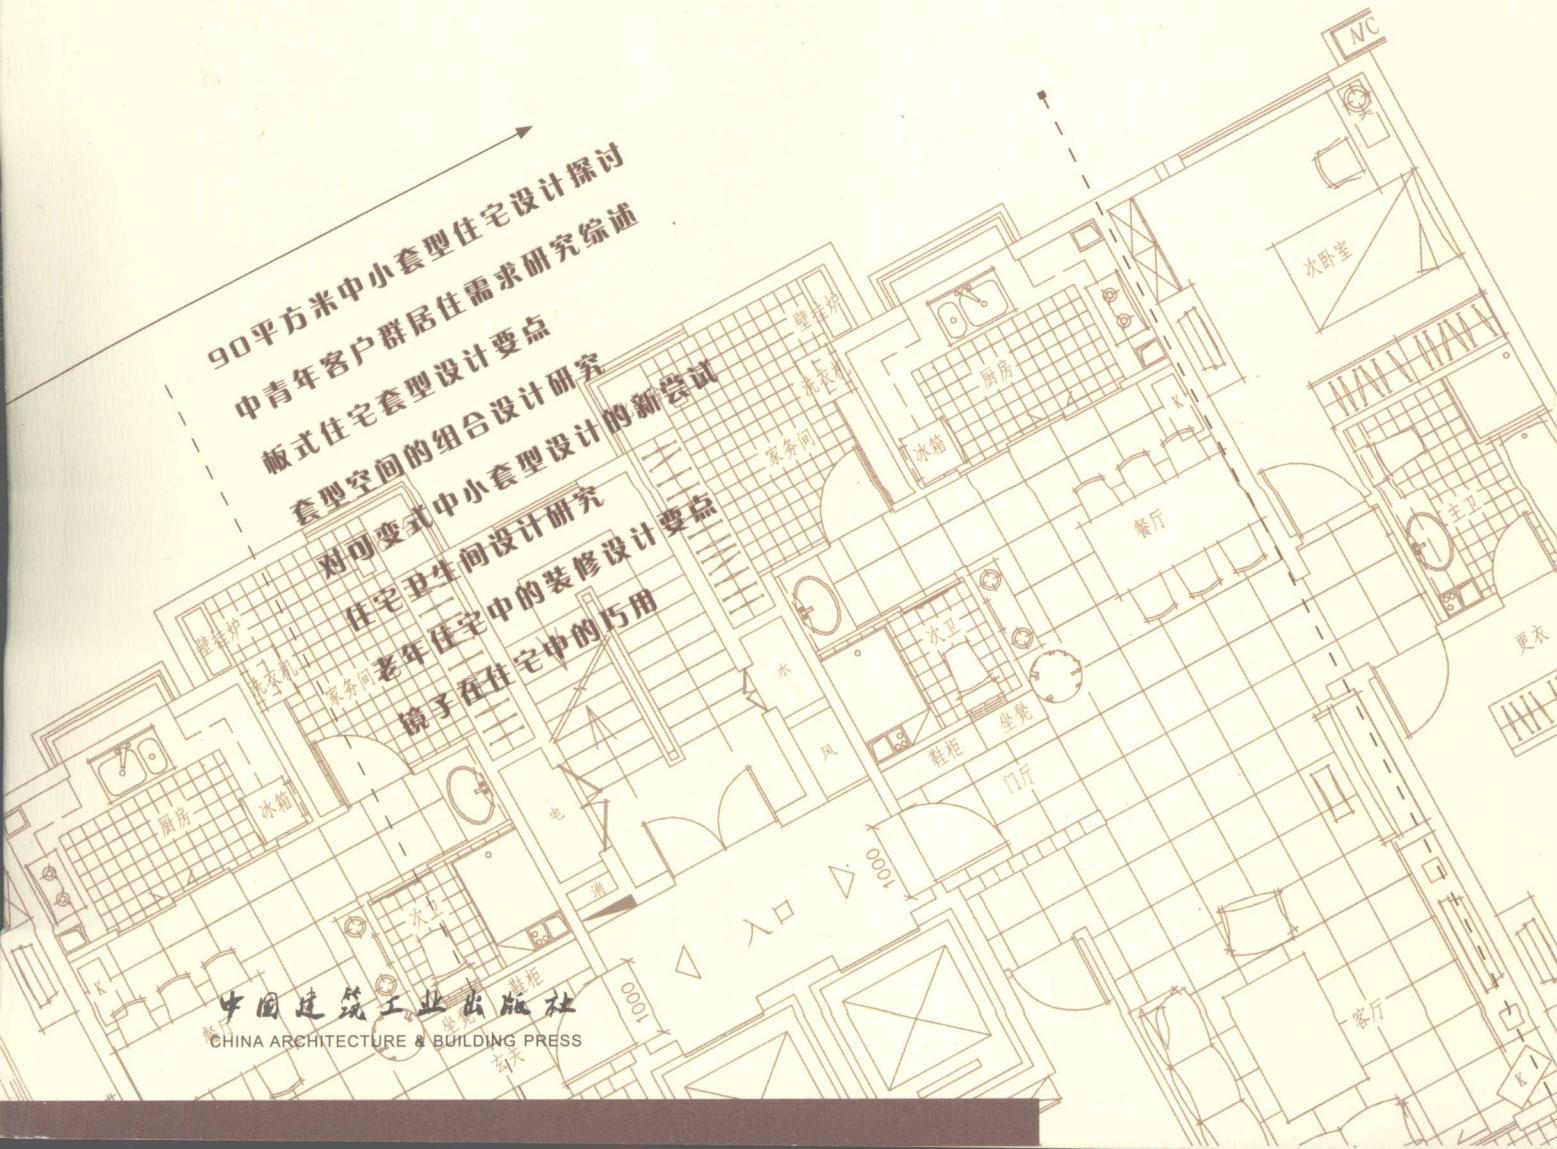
DETAILED DESIGN FOR DWELLINGS 住宅精细化设计
